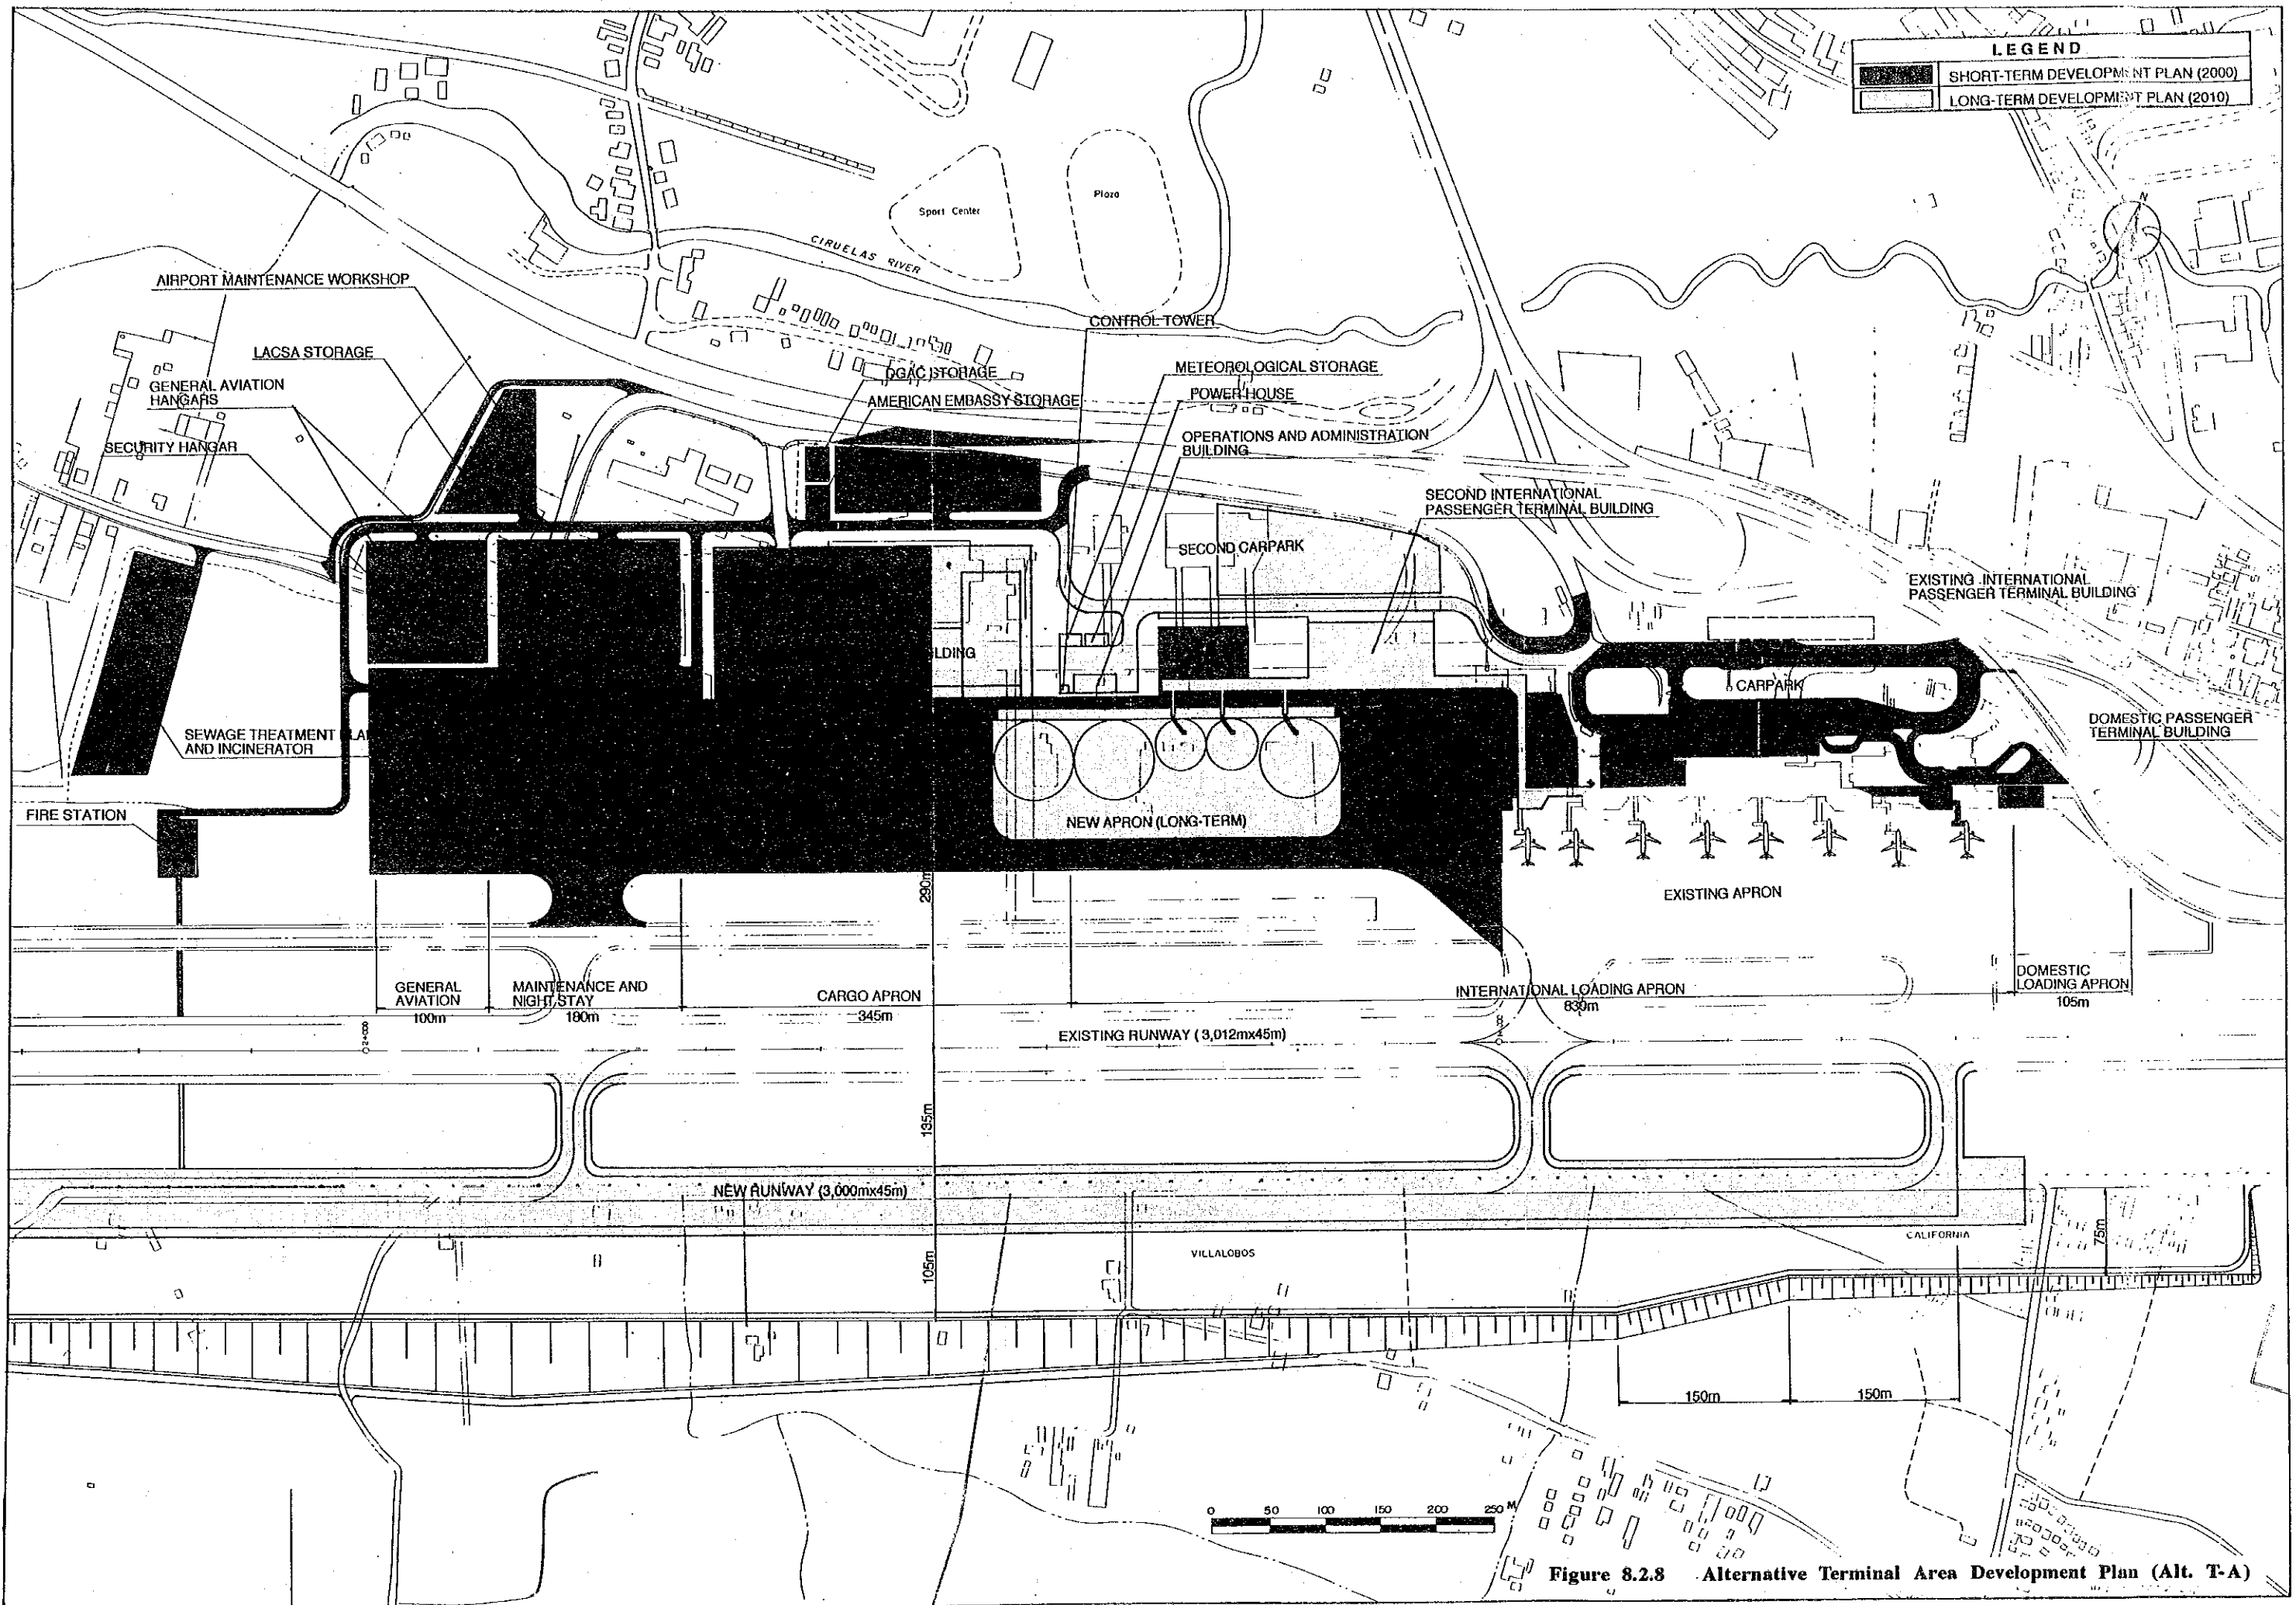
Alternative Terminal Area Development Plan (Alt. T-A)
